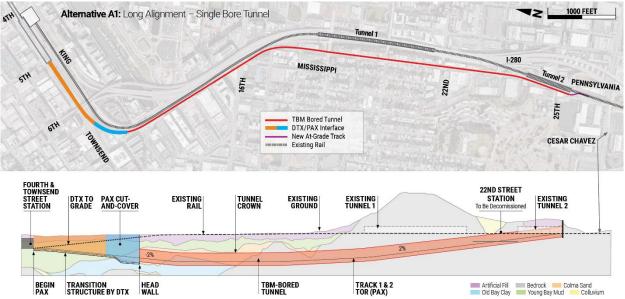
Long Alignment – Single Bore Tunnel. Rail and Existing Caltrain Tunnels noted. See also Appendix B.
